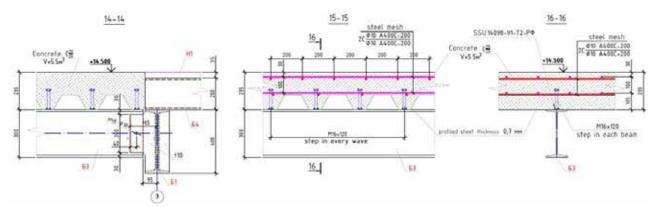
Fastening and reinforcement nodes of the steel-concrete slab
